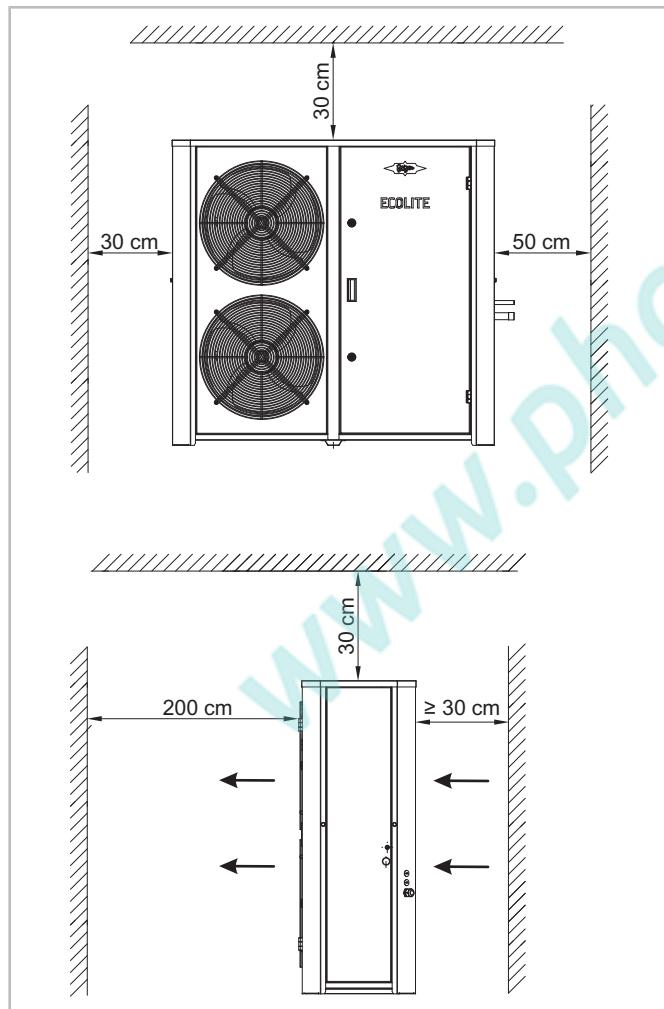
Minimum distances to the wall and ceiling (example shows LHL5E/ ..)
